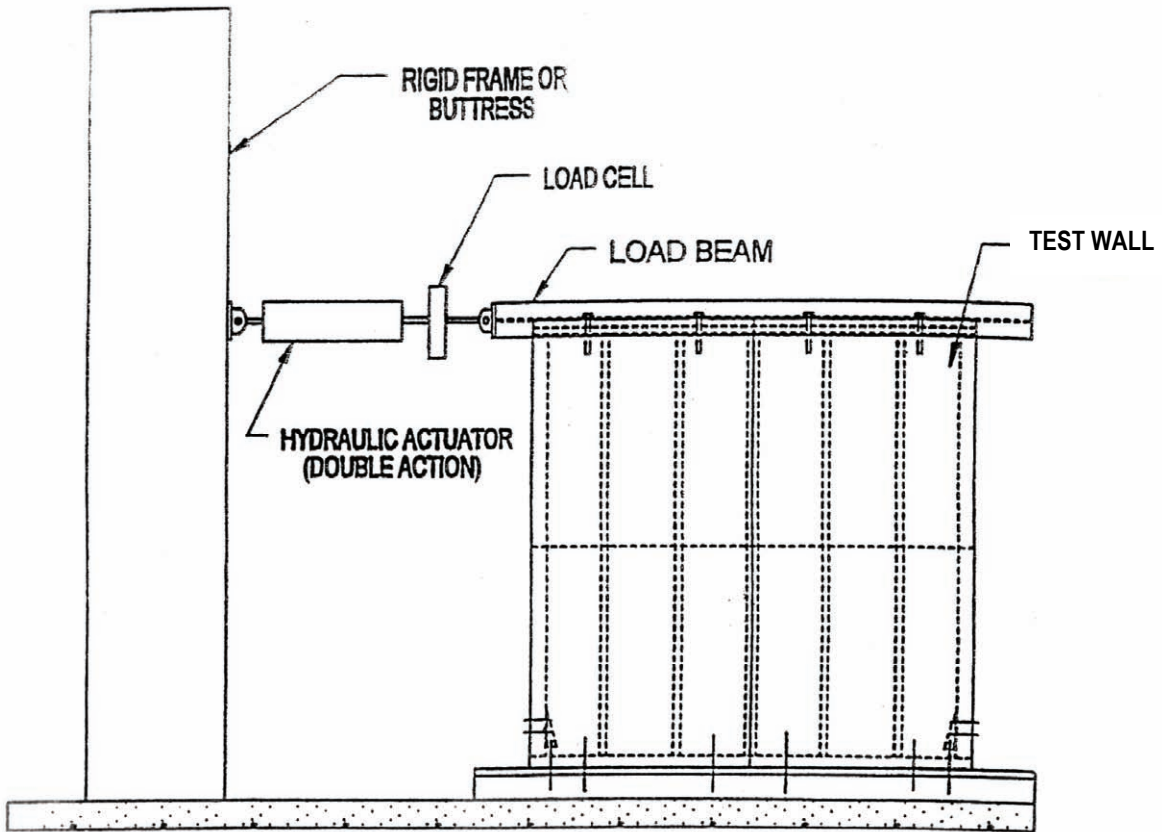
ASTM Standards generic test facility and setups for racking testing of shear-resisting wall panels.
